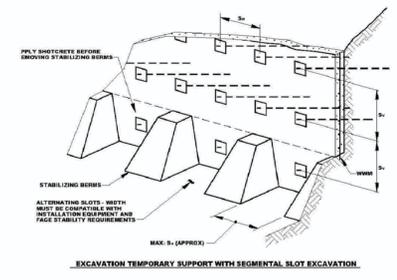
(b): Examples of Alternative Temporary Excavation Support: Slot Excavation. Modified from Porterfield et al. (1994).
